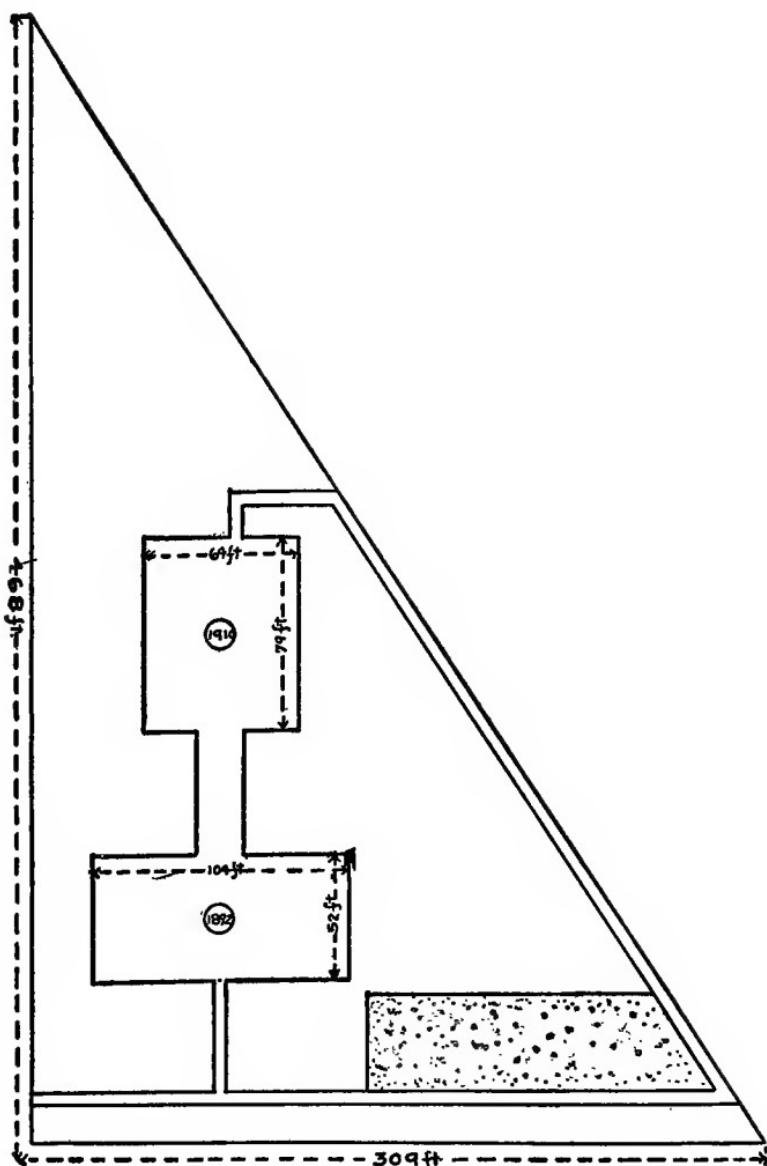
PLAN OF SCHOOL GROUNDS AT PARK SCHOOL
